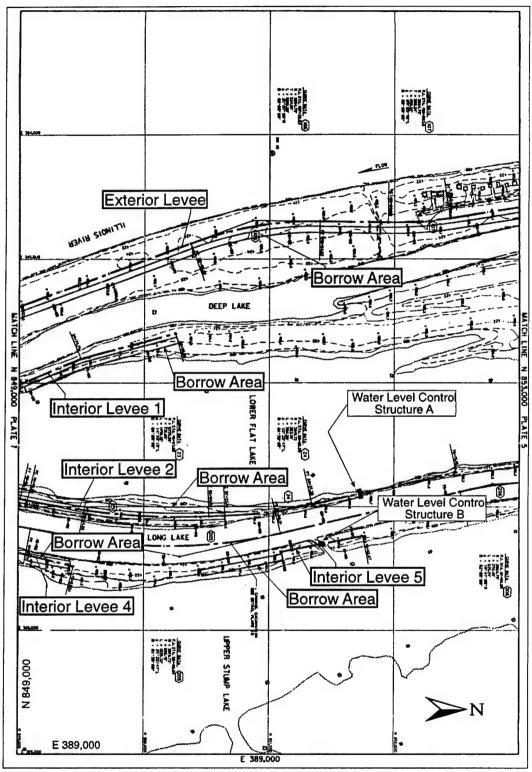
Stump Lake Complex HREP/EMP project area plan, N849,000-N853,000.
